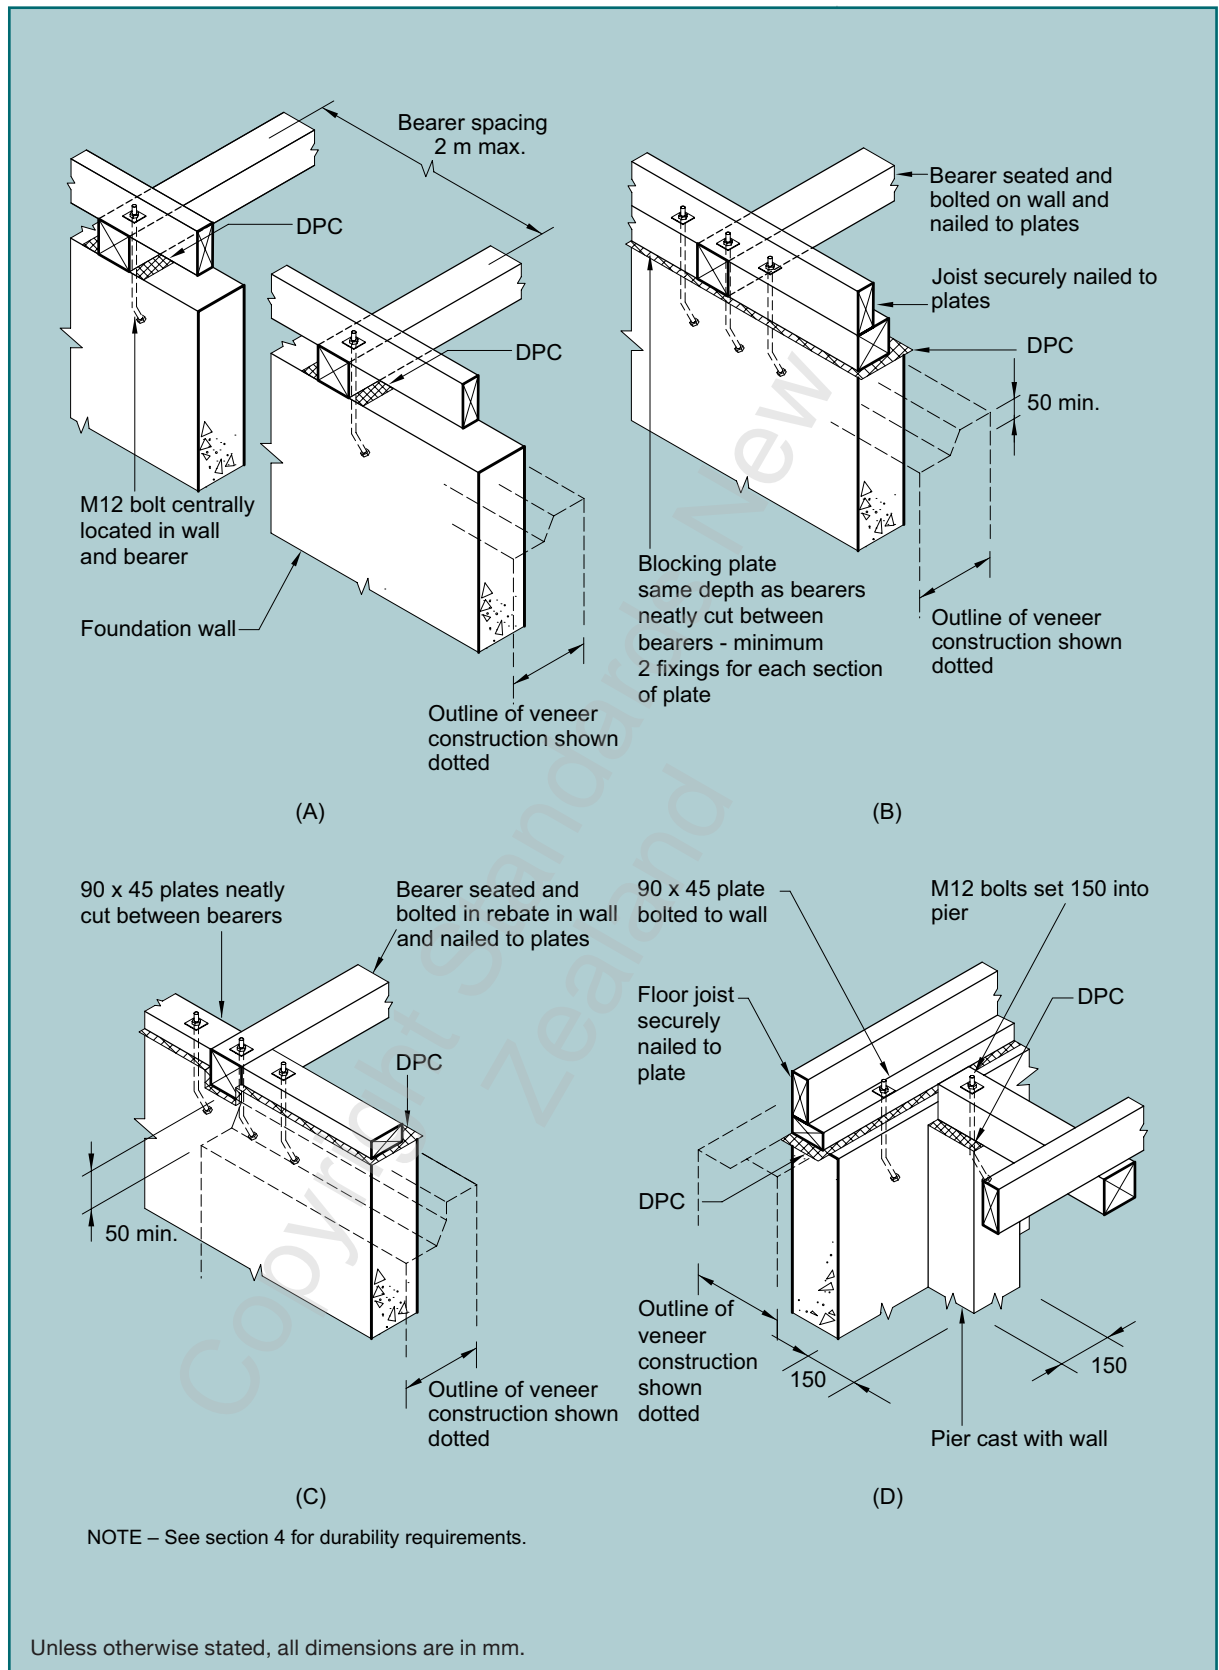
Fixing of bearers perpendicular to foundation walls (see 6.12.1)
